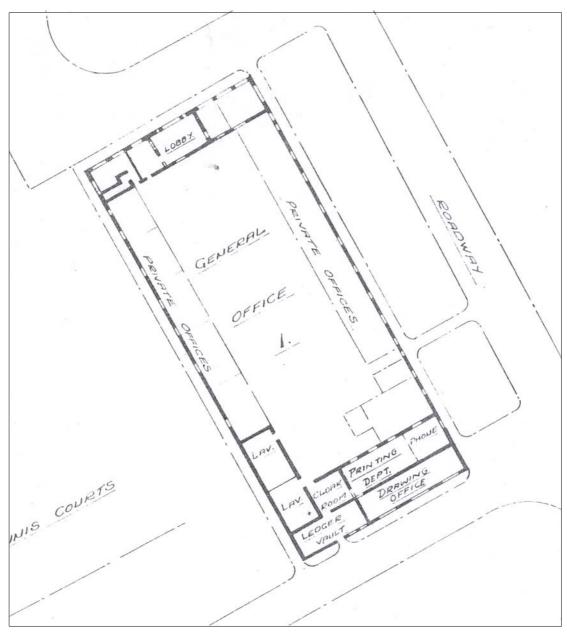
Original section of Building 1 as existing in 1935. (Source WALS Cat. No. WTON D/797).
